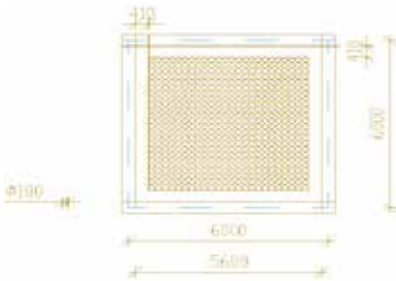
Structural layout of a flat lightweight reinforced concrete precast-monolithic slab with voids formed by plastic spheres.
